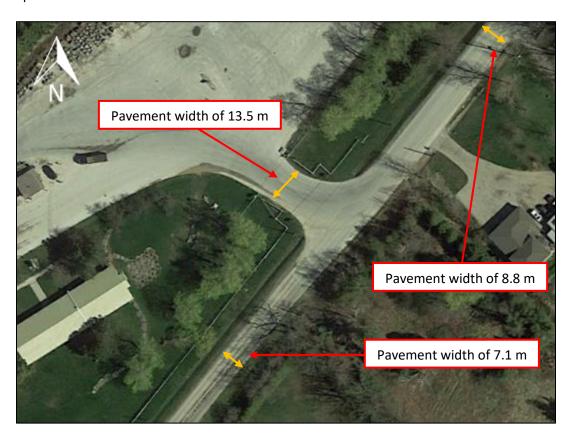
Pavement widths around the existing truck entrance (© Google, 2018)
